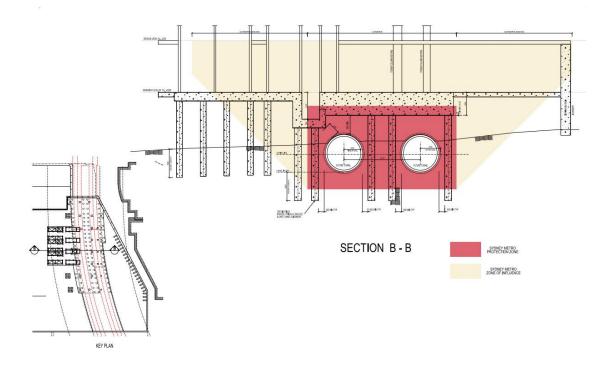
Tunnel protection zones at a typical section under a tower foundation
